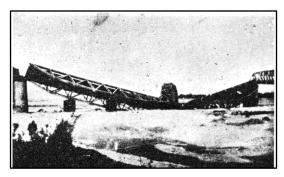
Supper structure of steel girder bridge overthrown due to failure of its bearings (Bihar earthquake 1934)
